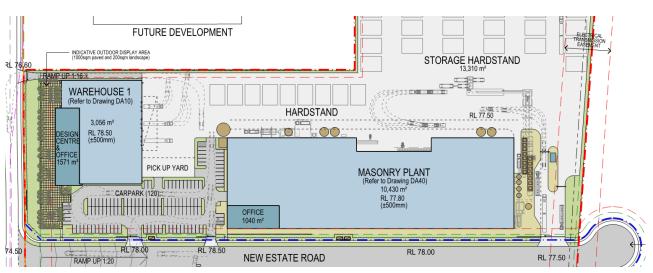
Warehouse 1 & Masonry Plant – Site Plan
